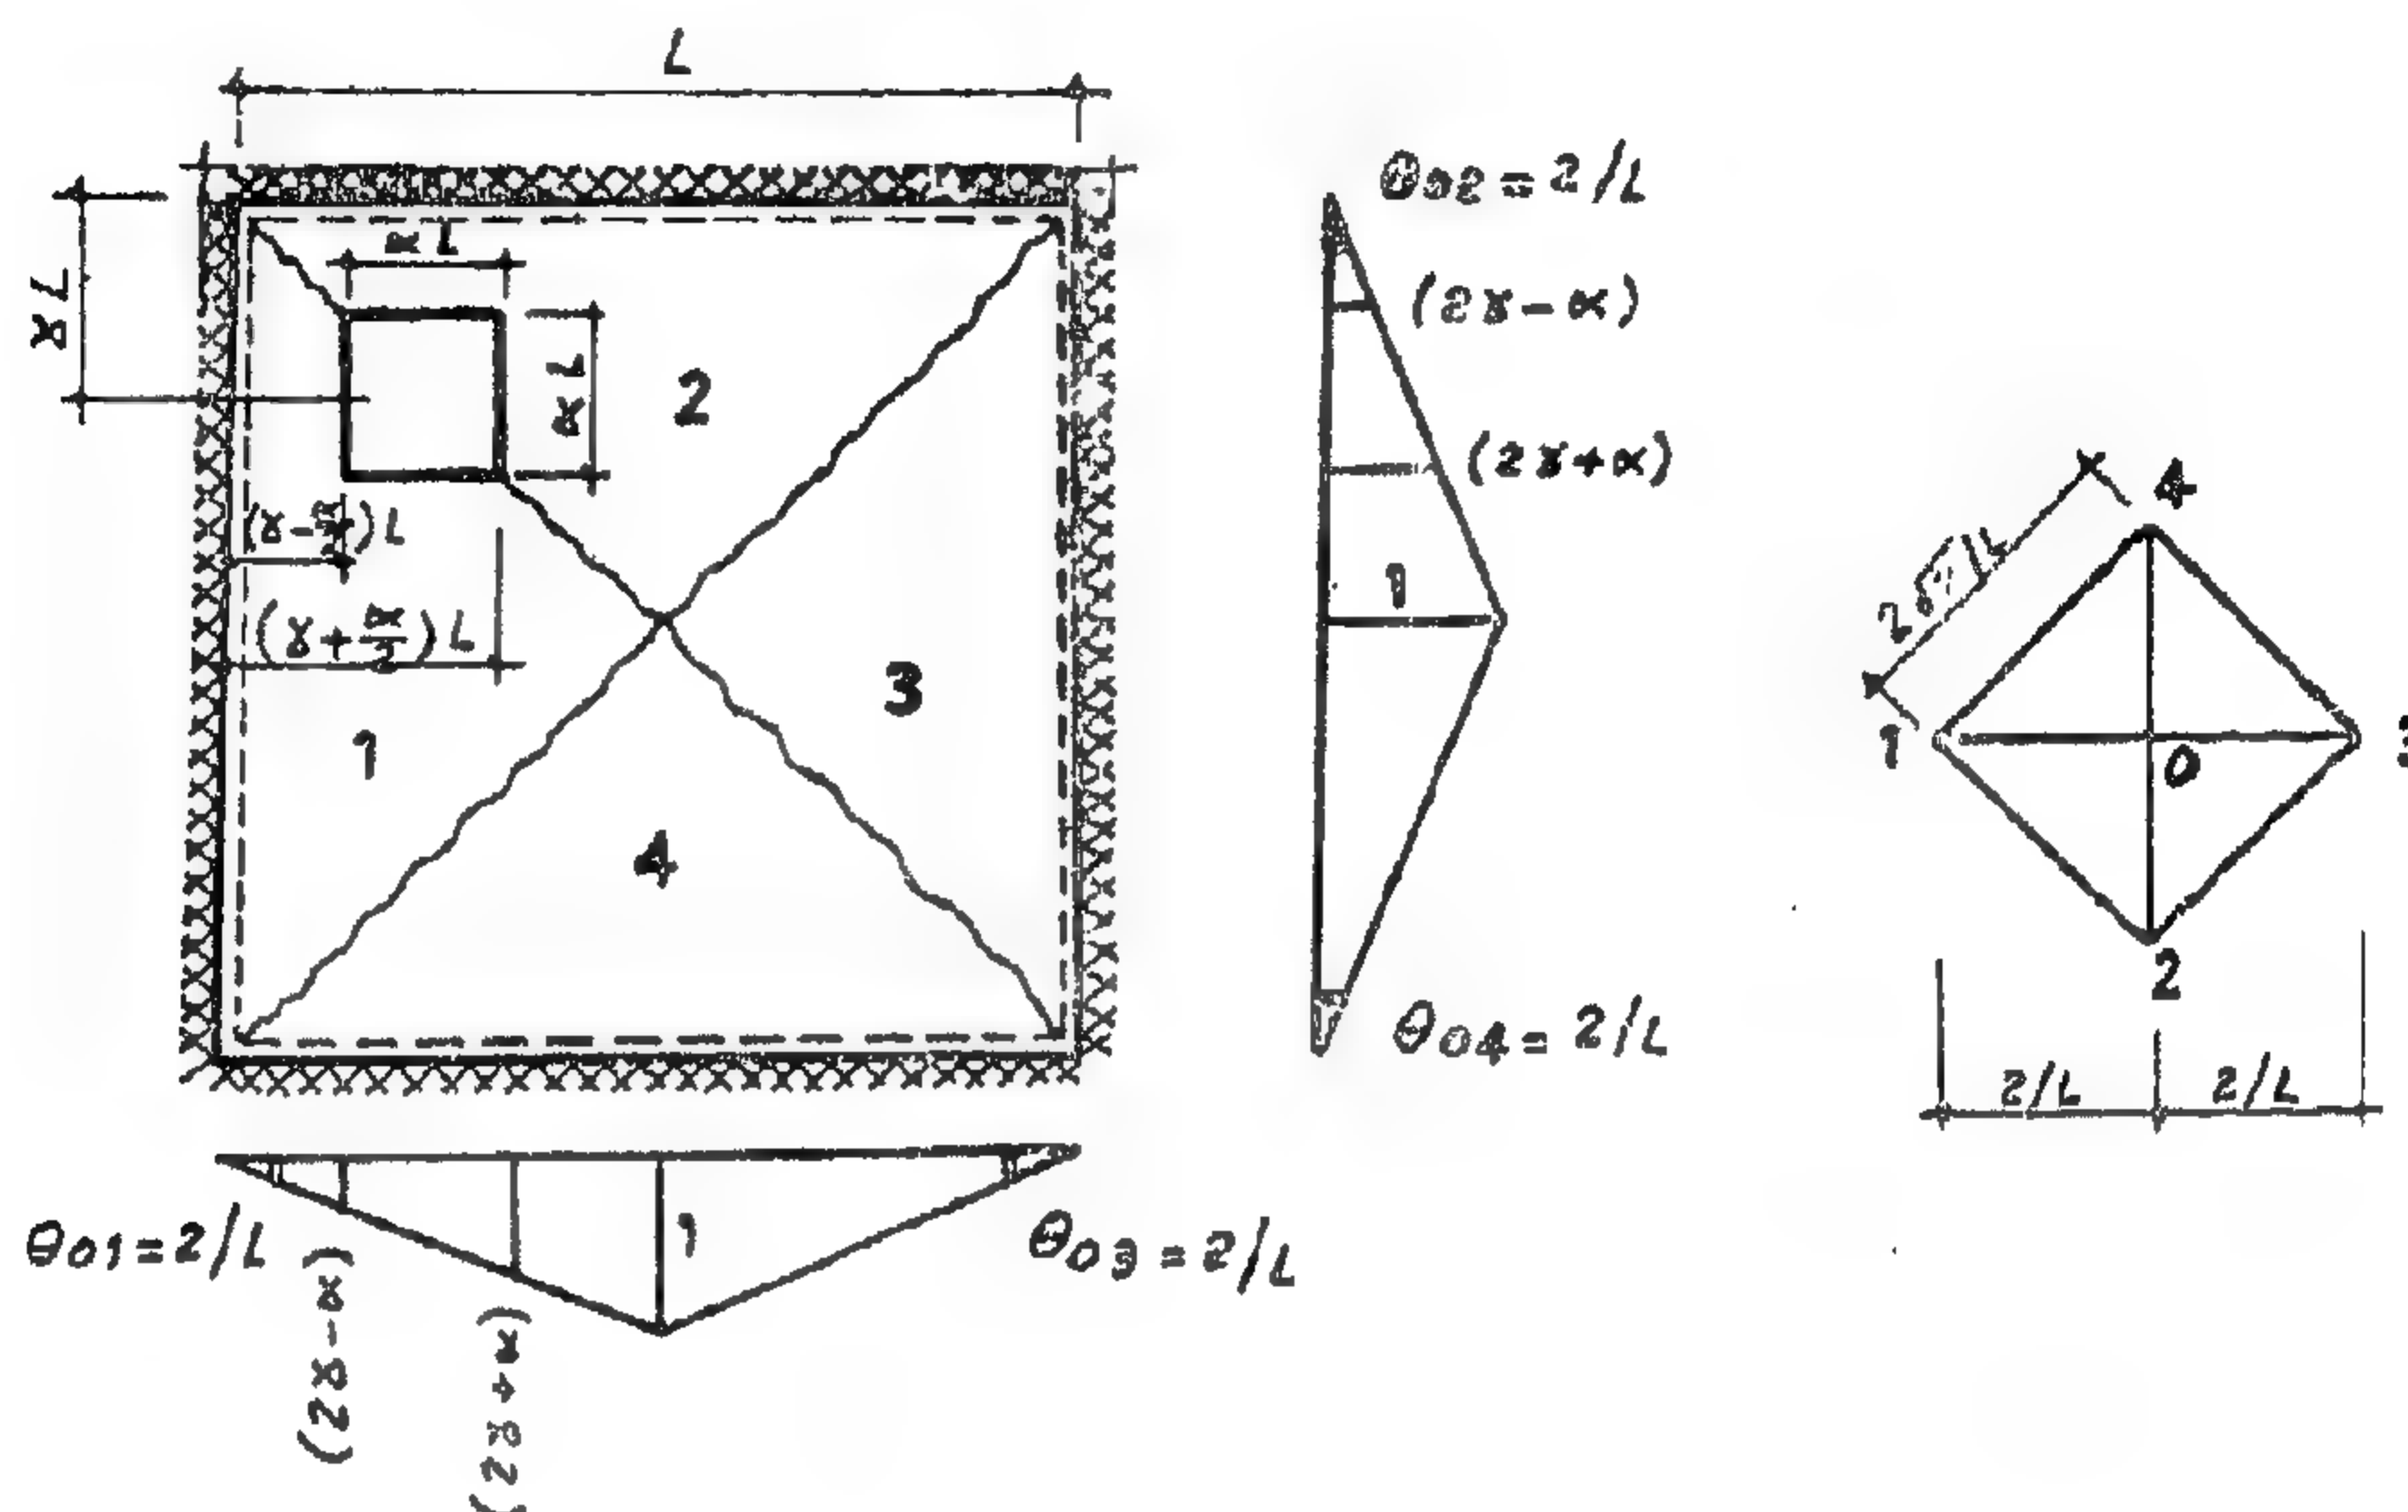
mode of failure (b) for fixed slab with eccentric opening
